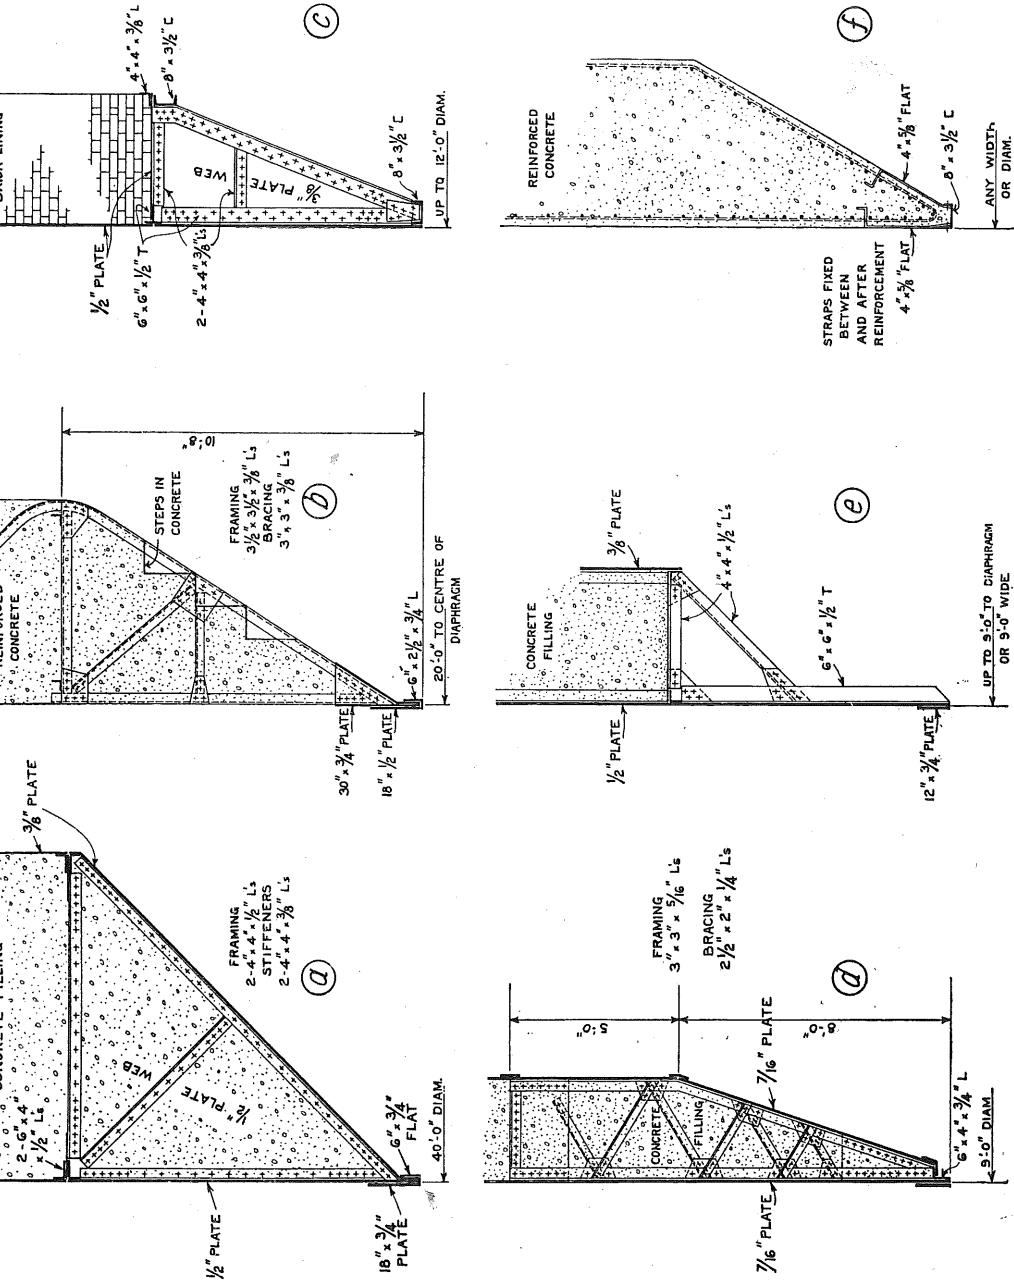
EXAMPLES OF CUTTING-EDGE DETAILS.
